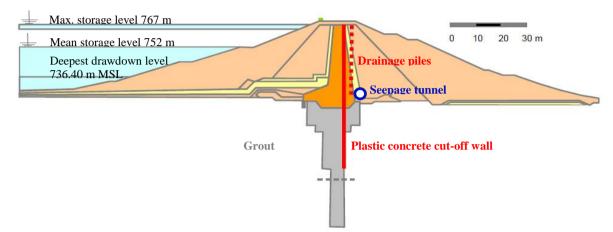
Standard cross section with cut-off wall, drainage piles and seepage tunnel
